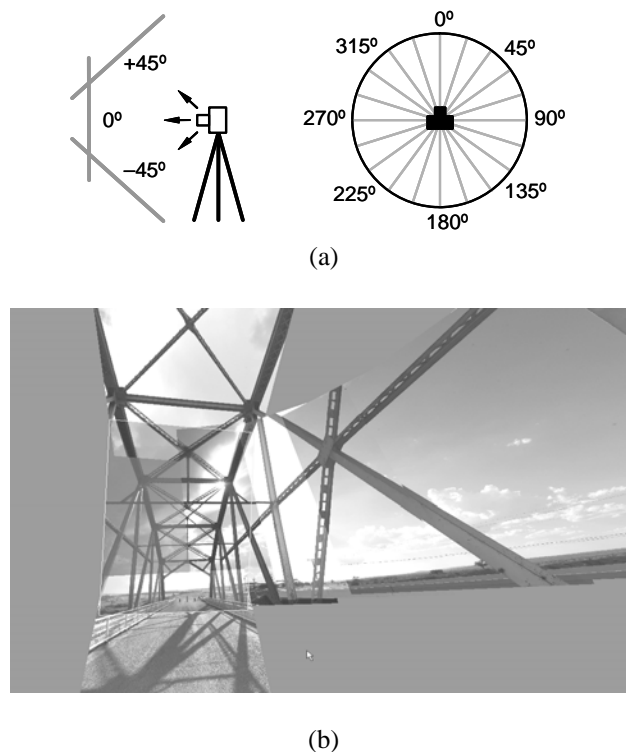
Creation of cubic panorama: (a) camera setup and (b) steel truss bridge example.
